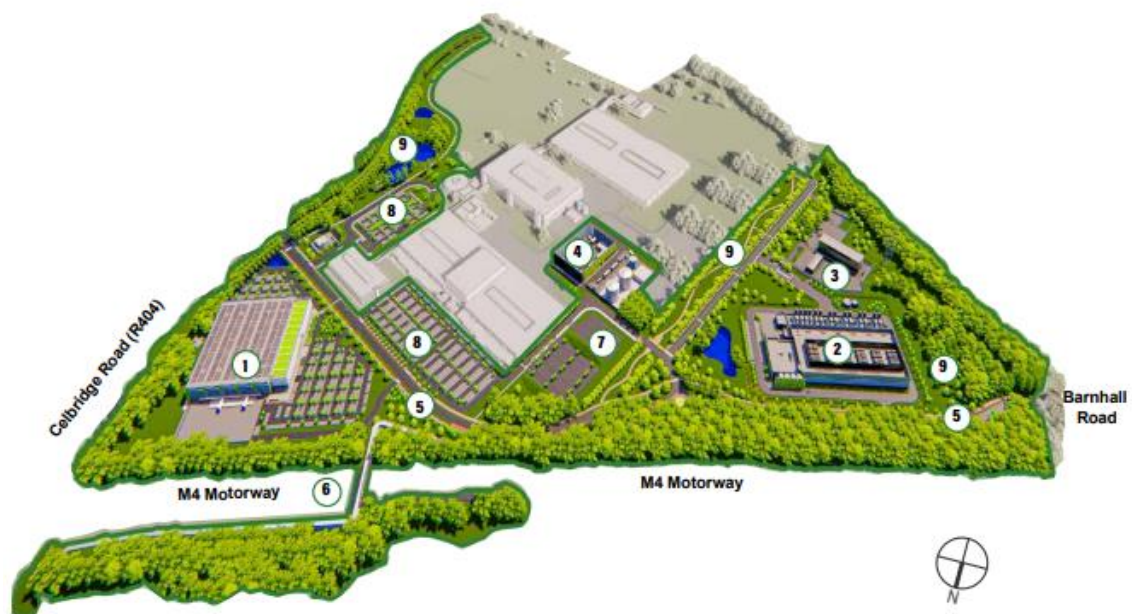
Kildare Innovation Campus Phase 1 Plan (Green Outline). Source: RKD Architectural Design Statement
